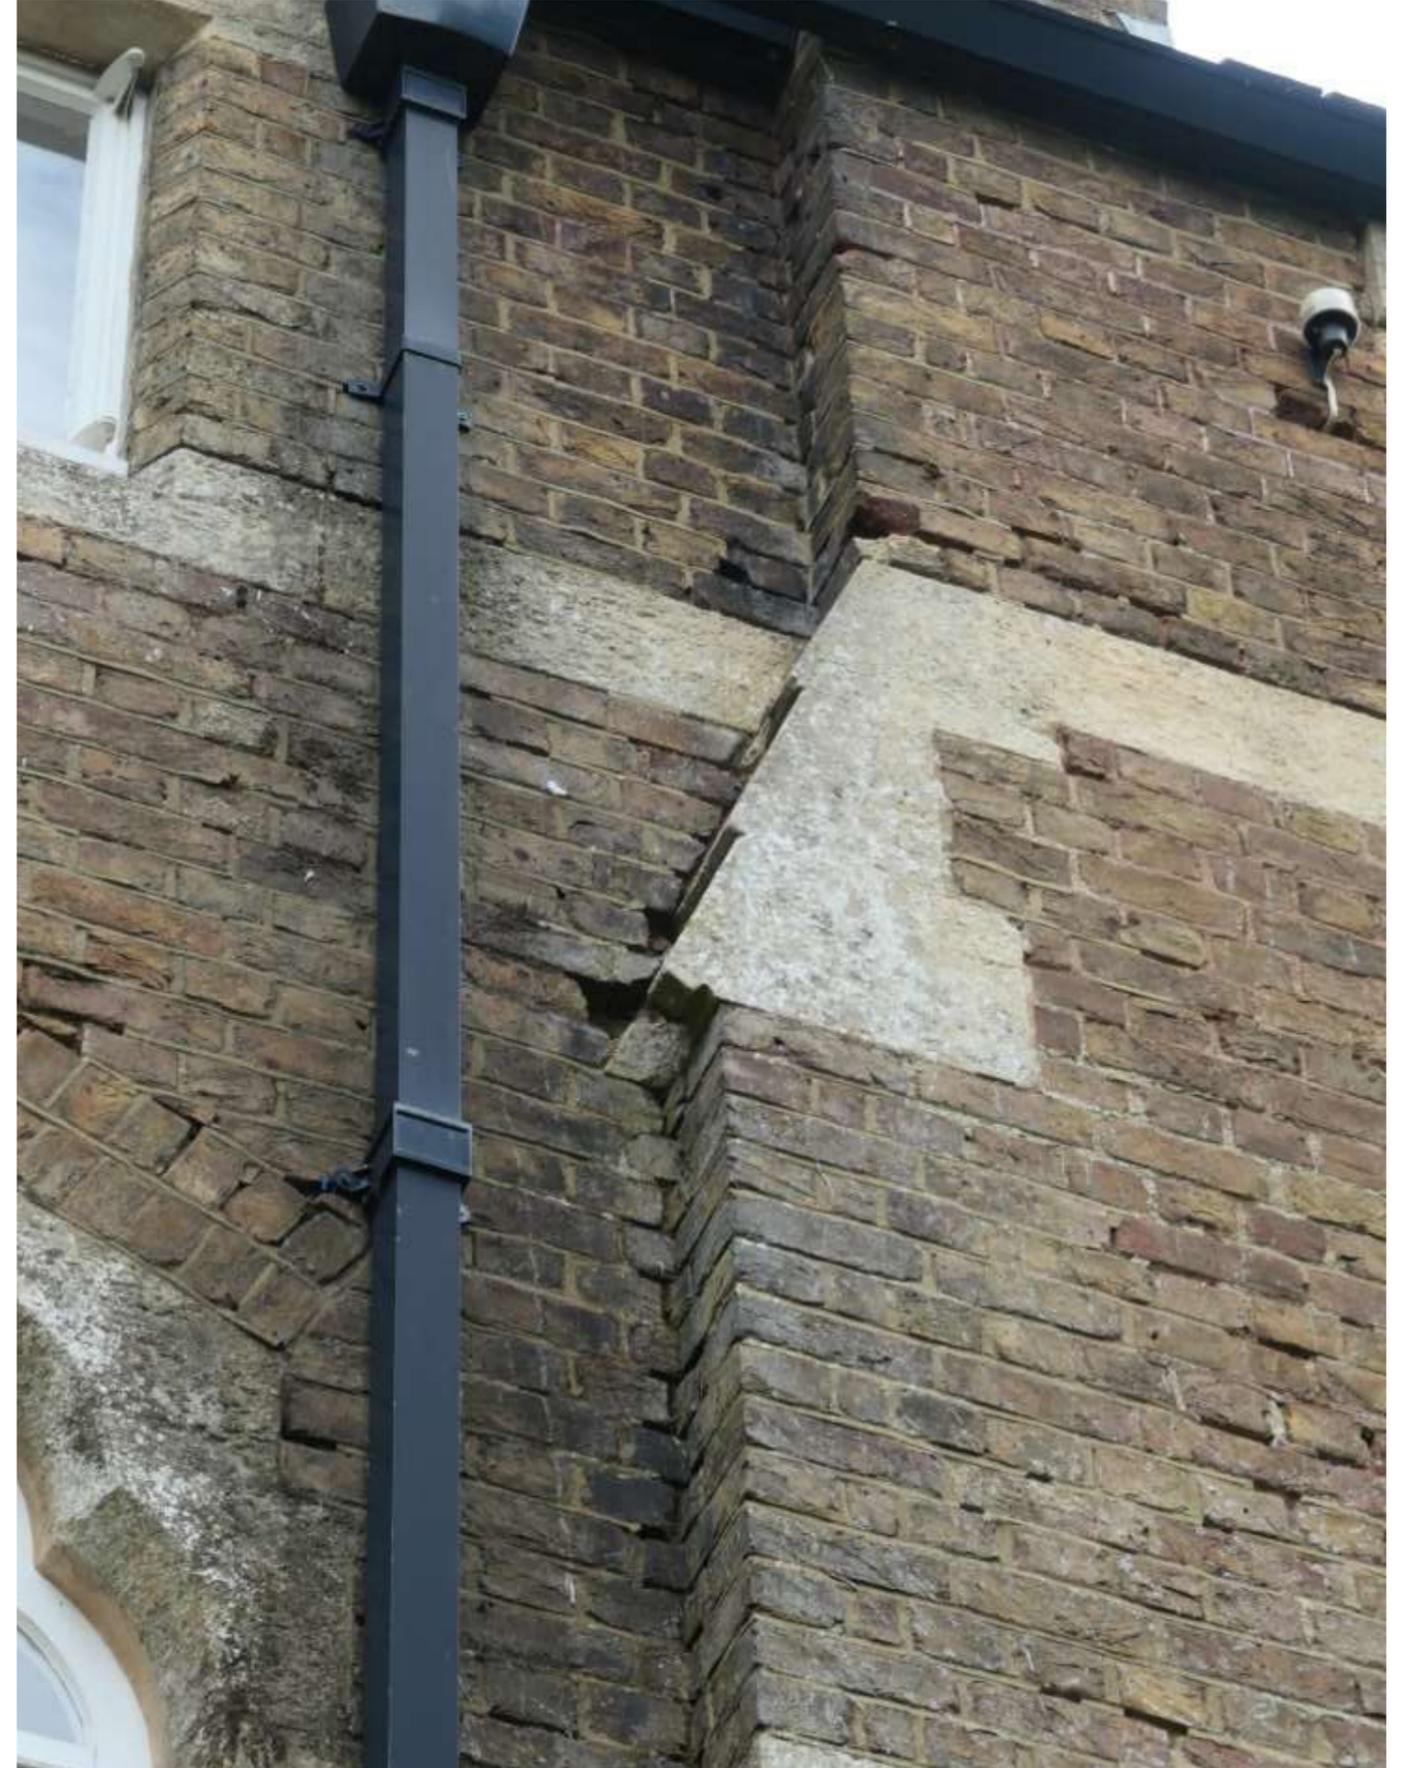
Modified openings to the façade of the main frontage, adjacent to the hall.
